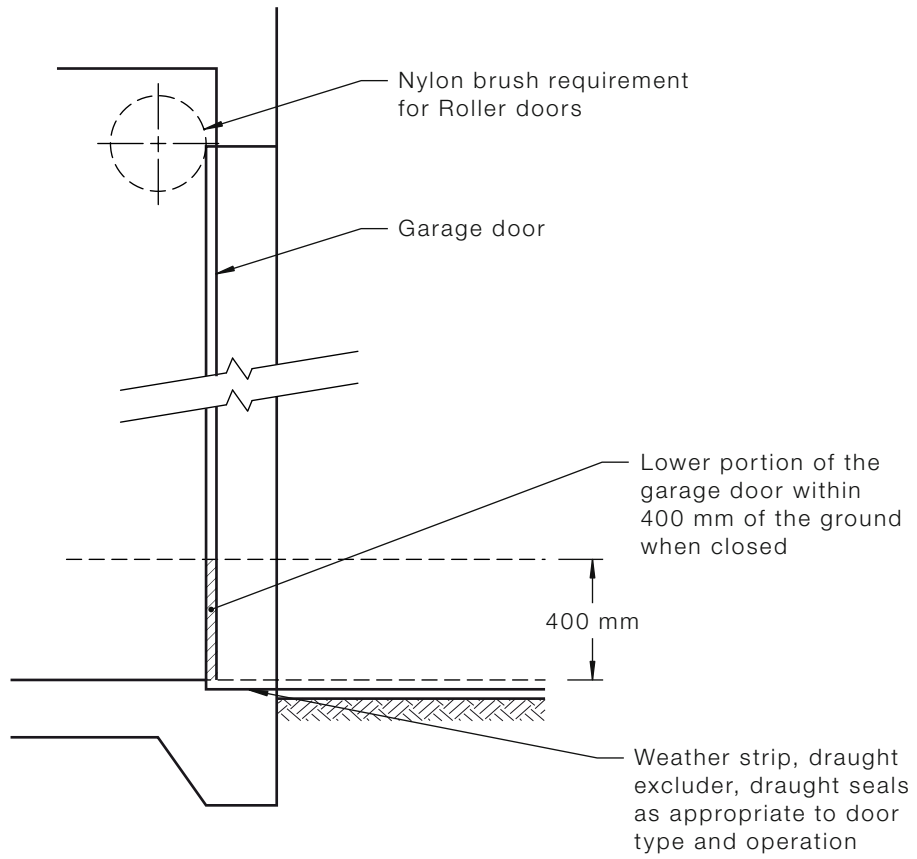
VEHICLE ACCESS DOORS (GARAGE DOORS)
